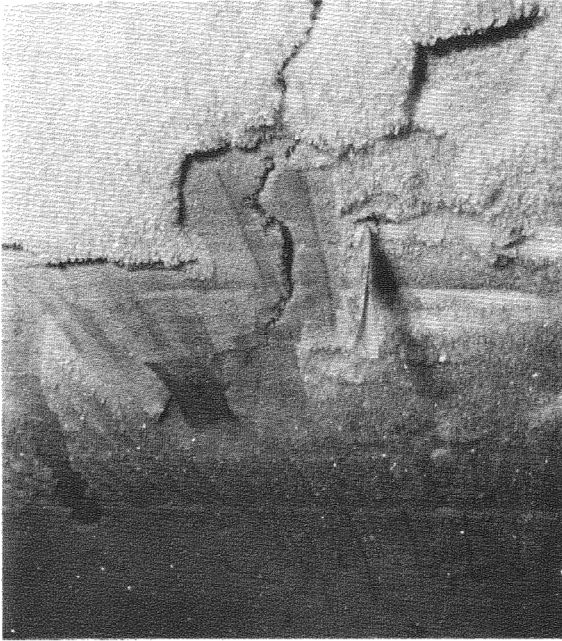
Crack in Fox Tunnel roof, approximately 6.1 m beyond end of culvert section. View toward right wall, 22 June 1964.
